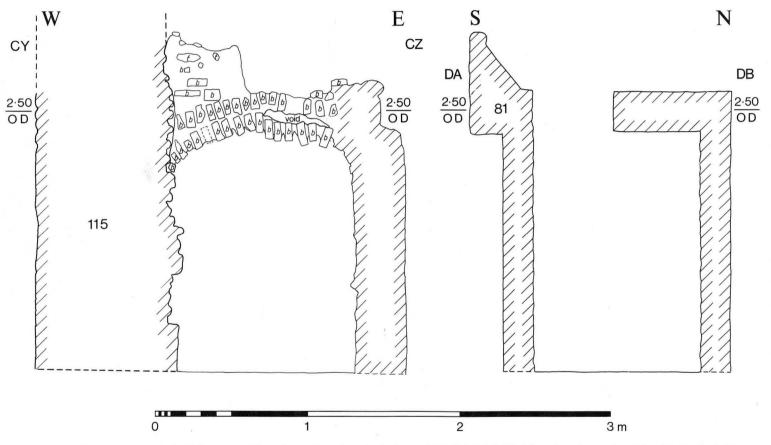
Phase II2 (east). Building 3132. Elevations of semi-vaulted pit 215 (CY-CZ, DA-DB). Elevations located on Fig. 43. Scale 1:25.
